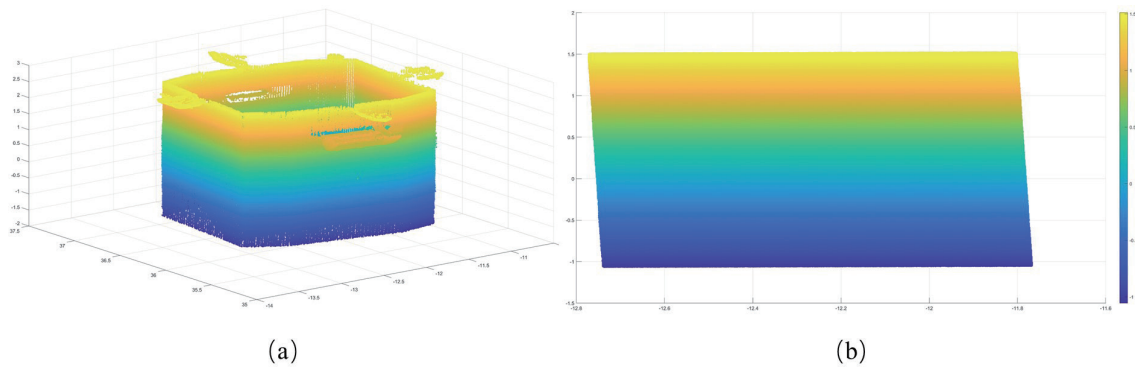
(Color online) Interpolation method used to homogenize the bridge pier point cloud: (a) interpolated bridge pier point cloud and (b) interpolated bridge pier point cloud expansion.
